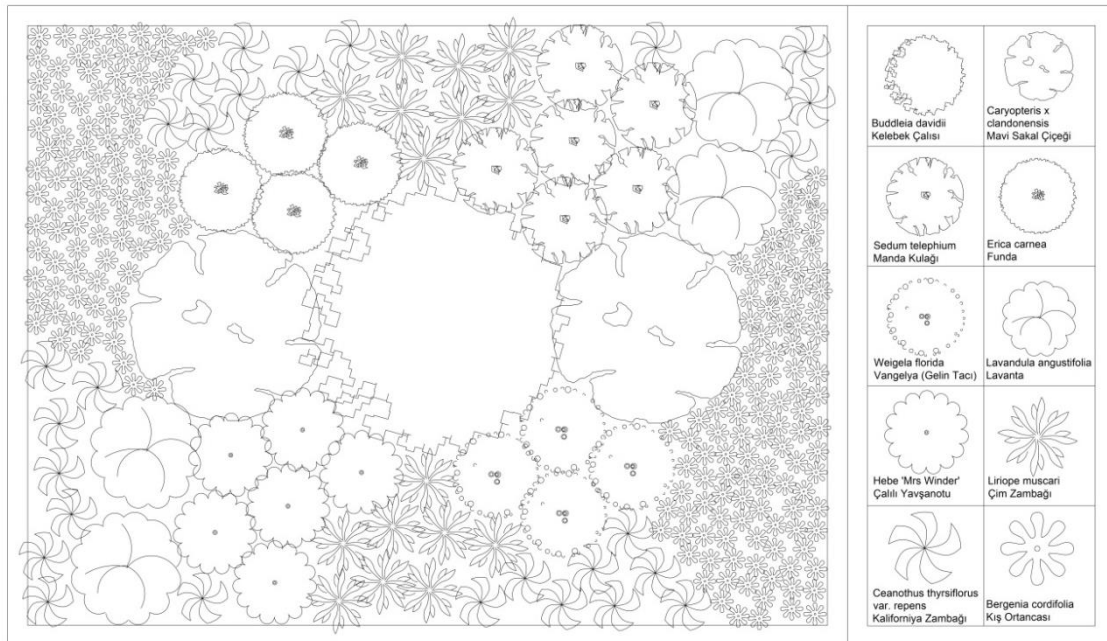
Planting design plan with purple color effect (Scale: 1/40)
